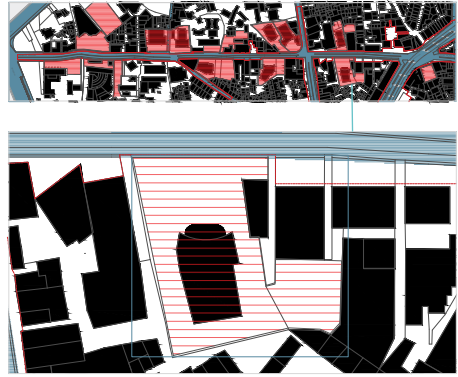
ODEON CINEMA - PLAN & ELEVATION - Scale: 1:500
